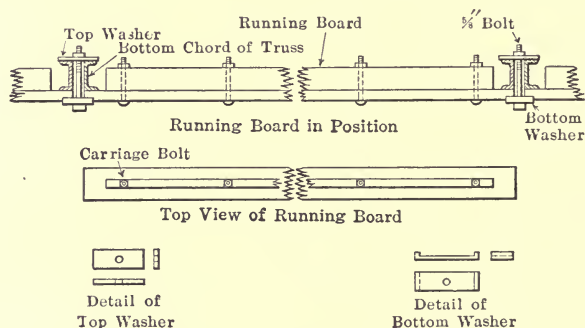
DETAILS OF RUNNING BOARDS AND FITTINGS.
